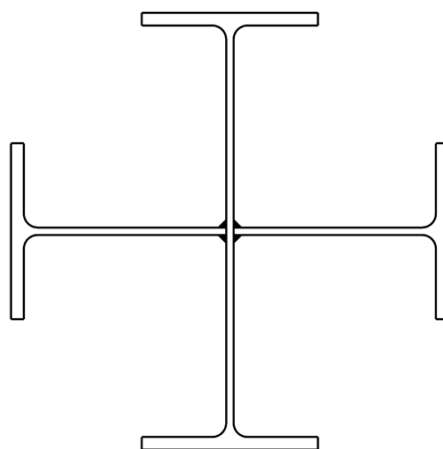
Typical Flanged Cruciform Cross-Section
